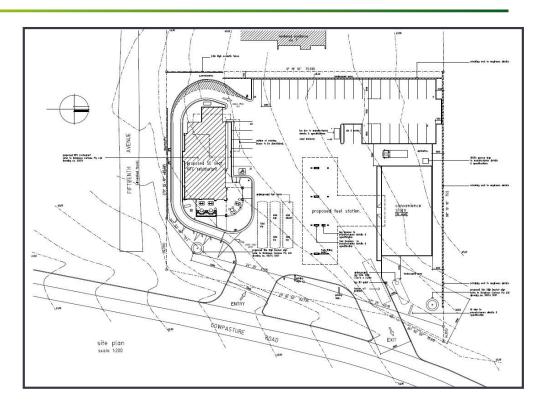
Existing Site Plan (Source: Mosca Pserras Architects)
